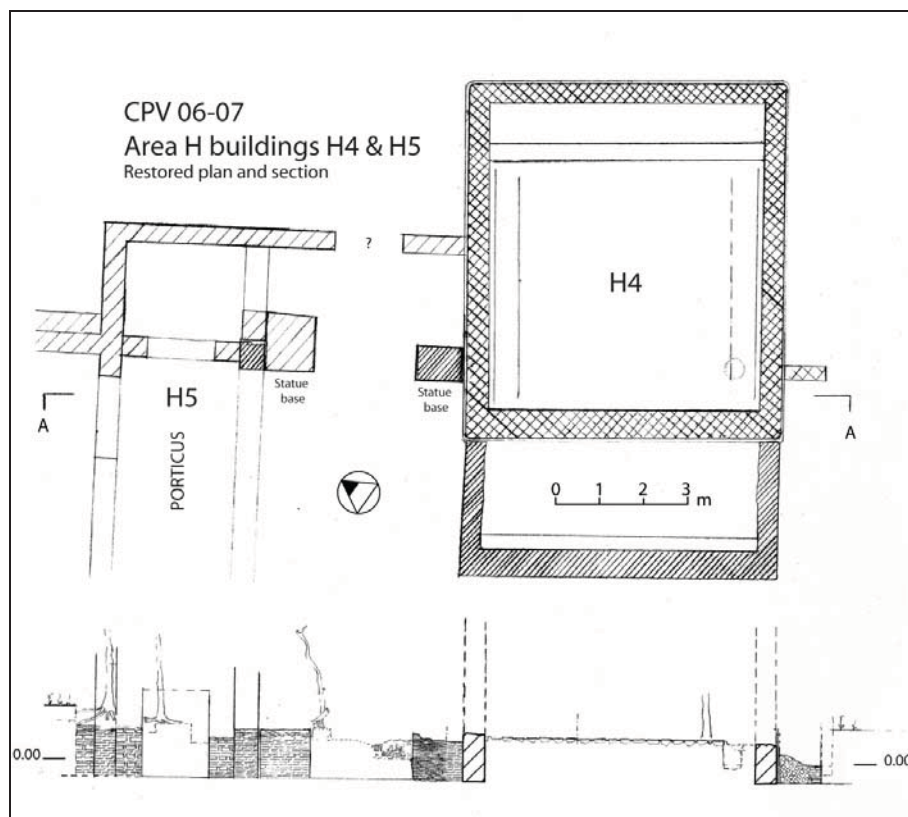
Vicus, Forum area H trenches 1-9, restored sketch plan and section.
